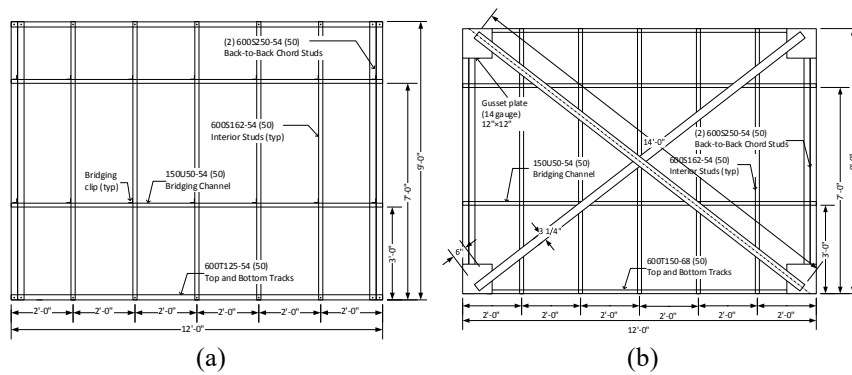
Framing: (a) sheathed walls; (b) strap braced walls (1 ft. = 2.54 cm)
